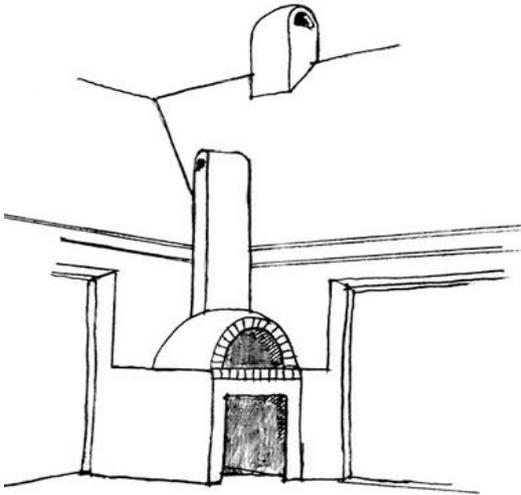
Pizza oven and flue: illustration of typical installation in the corner of sea facing patio.
